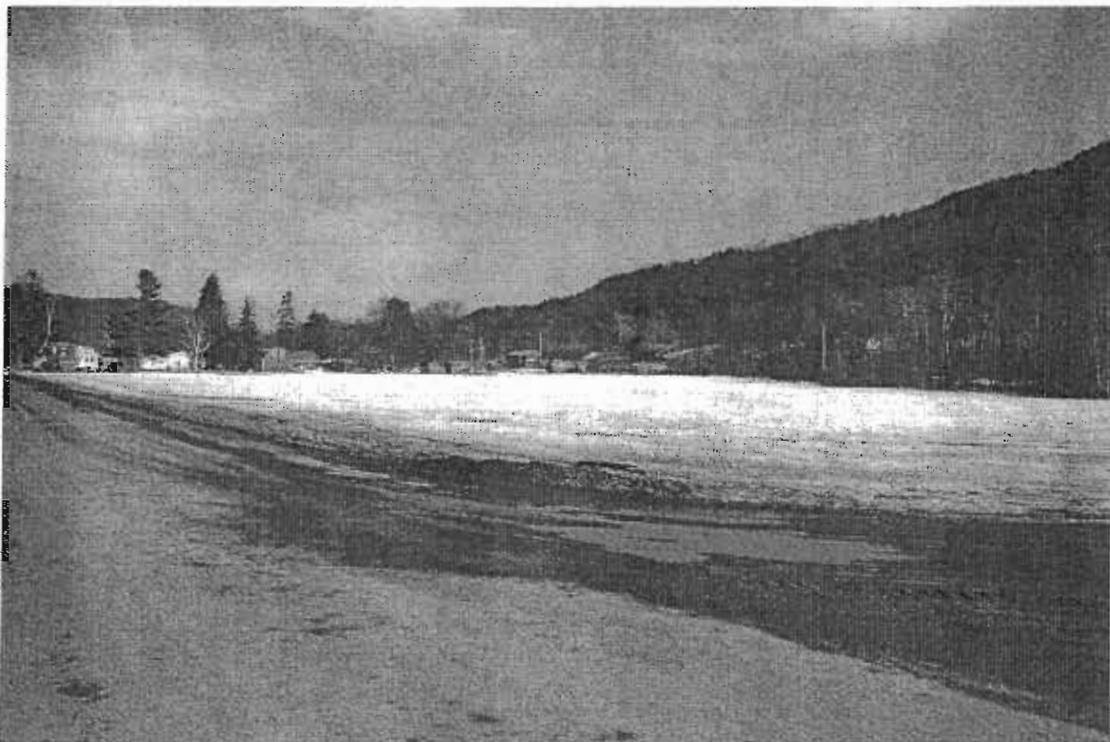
Portion of panoramic view from the entrance to the project on River Road, facing southeast.
